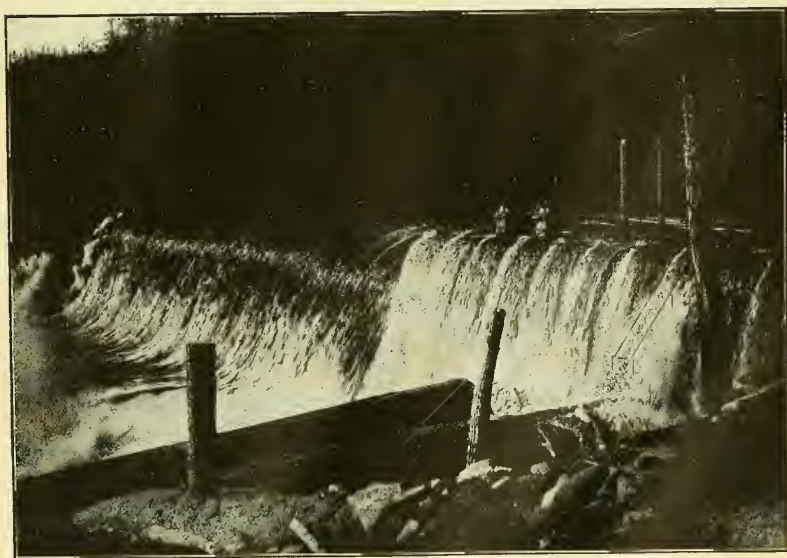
TARIFFVILLE DAM, WITH 9.5-FOOT FLOOD.
